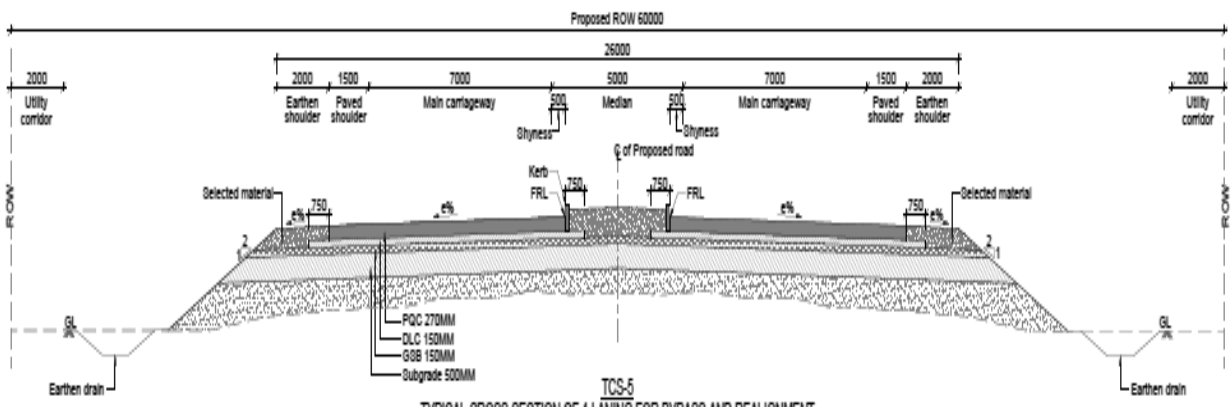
TCS-5 Typical Cross Section Of 4-Laning for Bypass and Realignment
